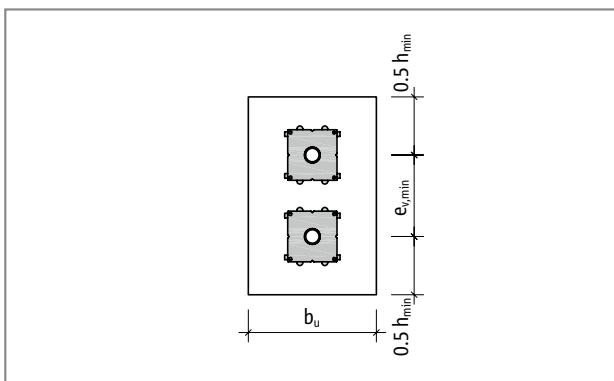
Schöck Dorn type SLD-Q: Minimum structural component dimensions and dowel spacings in the front face of a beam or wall
